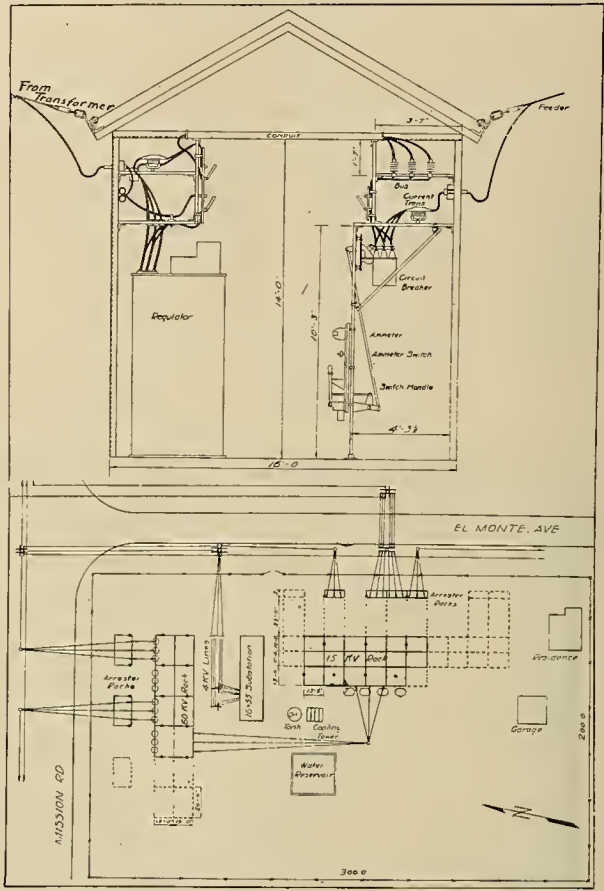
Below—plot plan. Above—section through station building, Anita substation.
